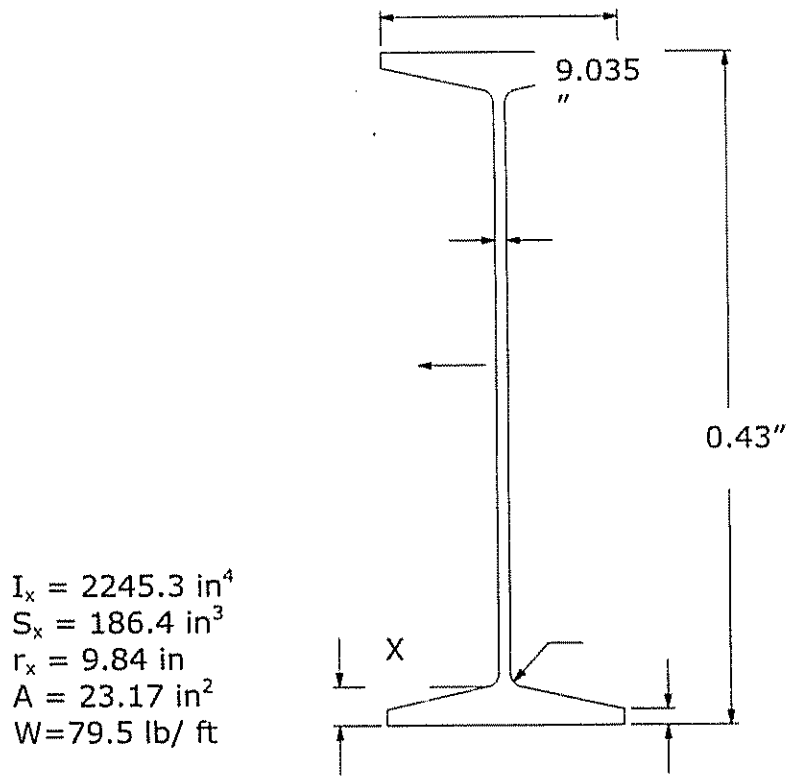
Original cross section of girder used in the full-scale rehabilitation.
